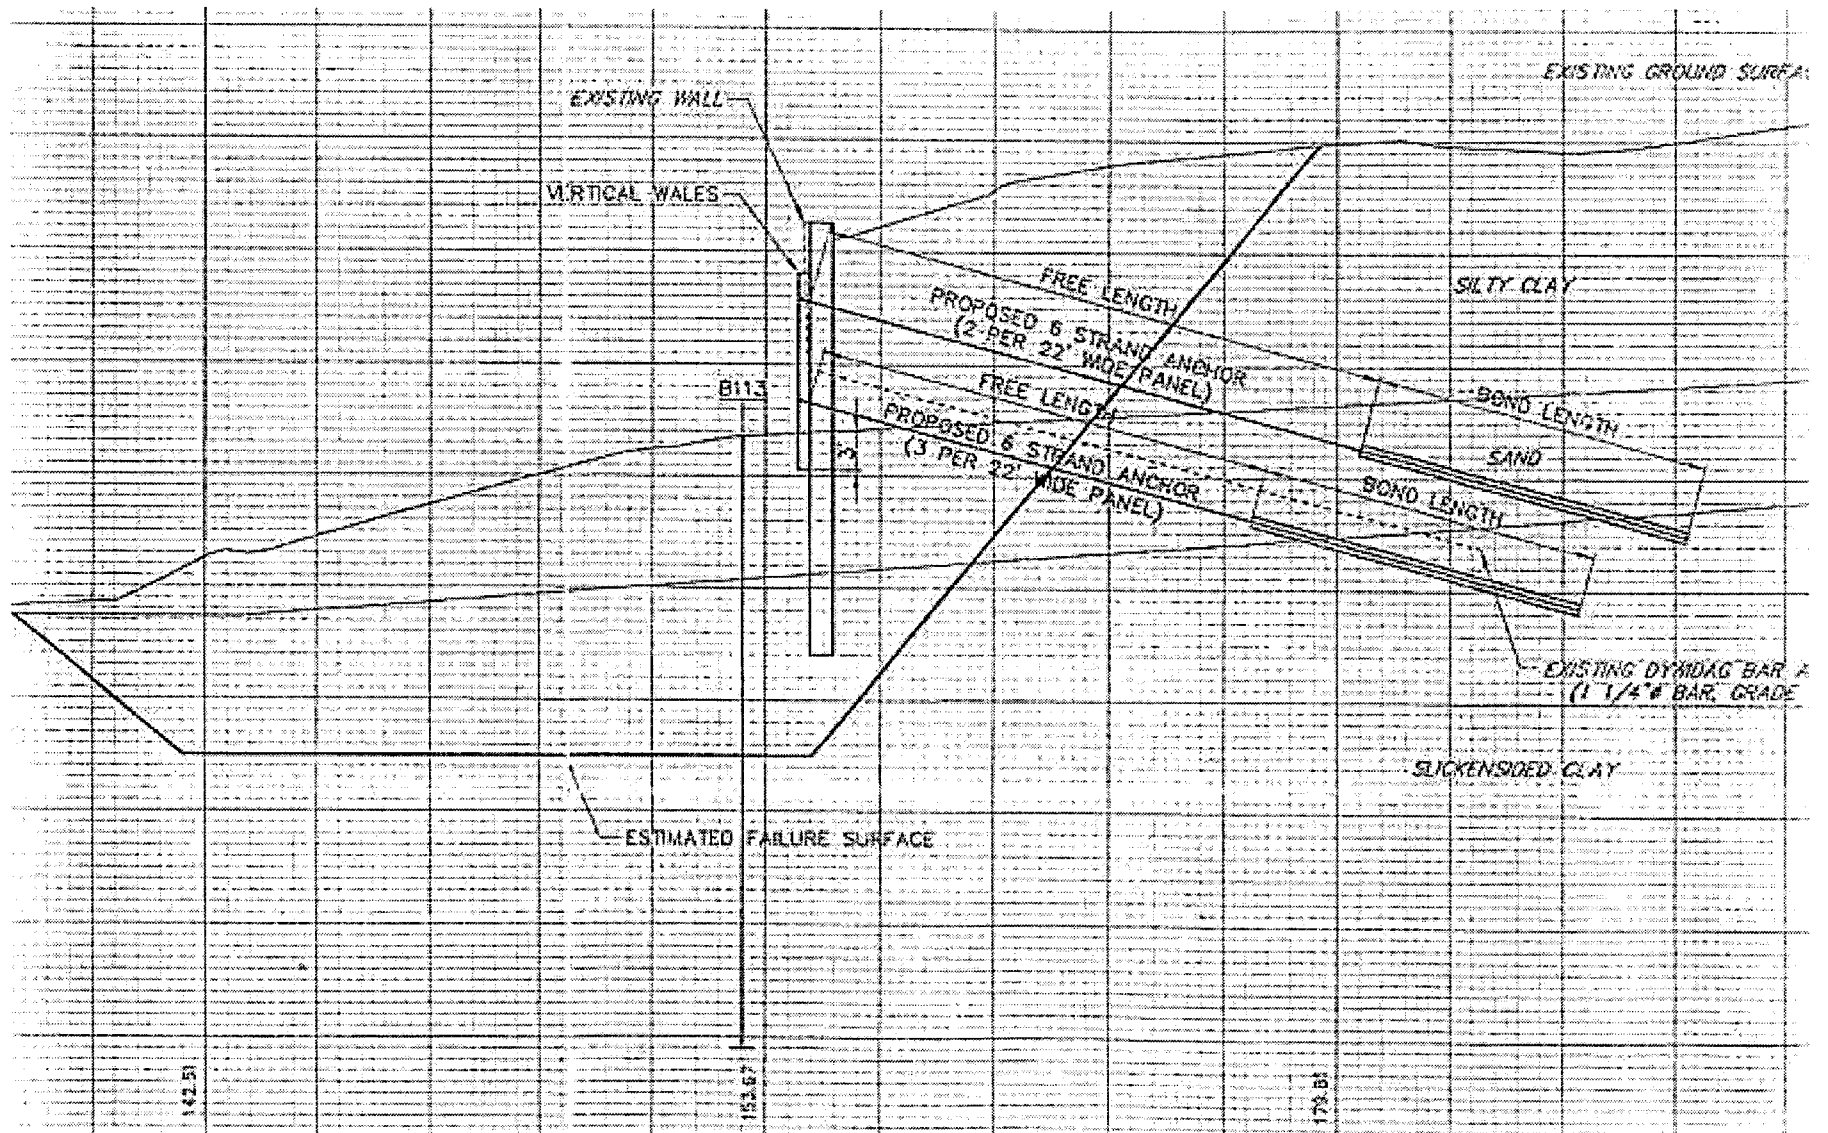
Cross section of O Street retaining wall near Panel 32, Washington, D.C.
